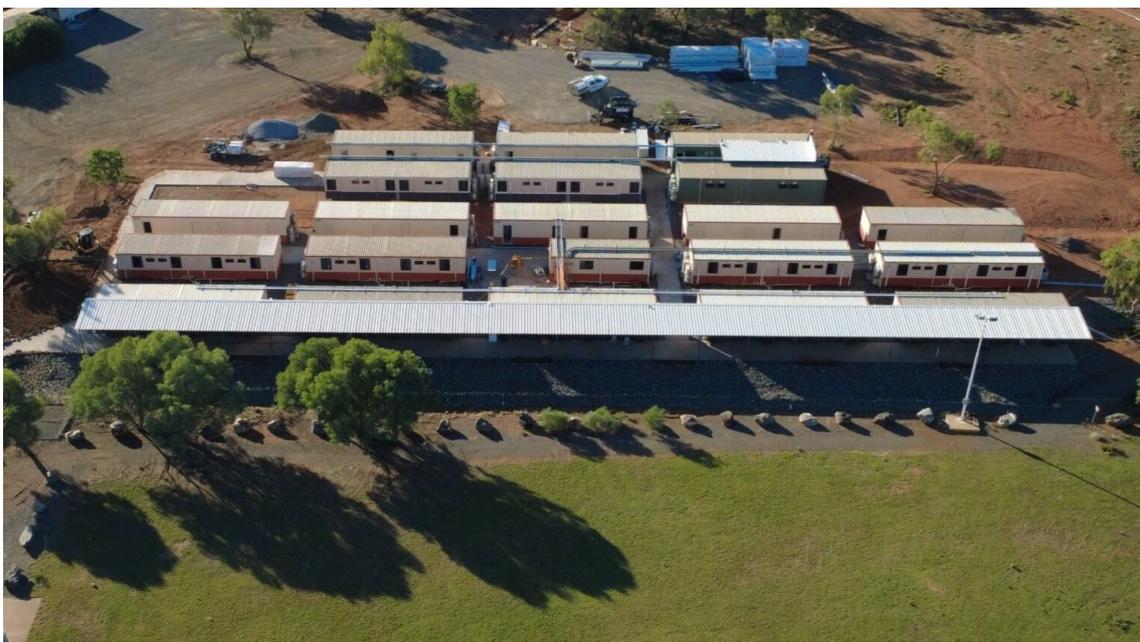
New rooms at the Eloise accommodation village – installation progress.
